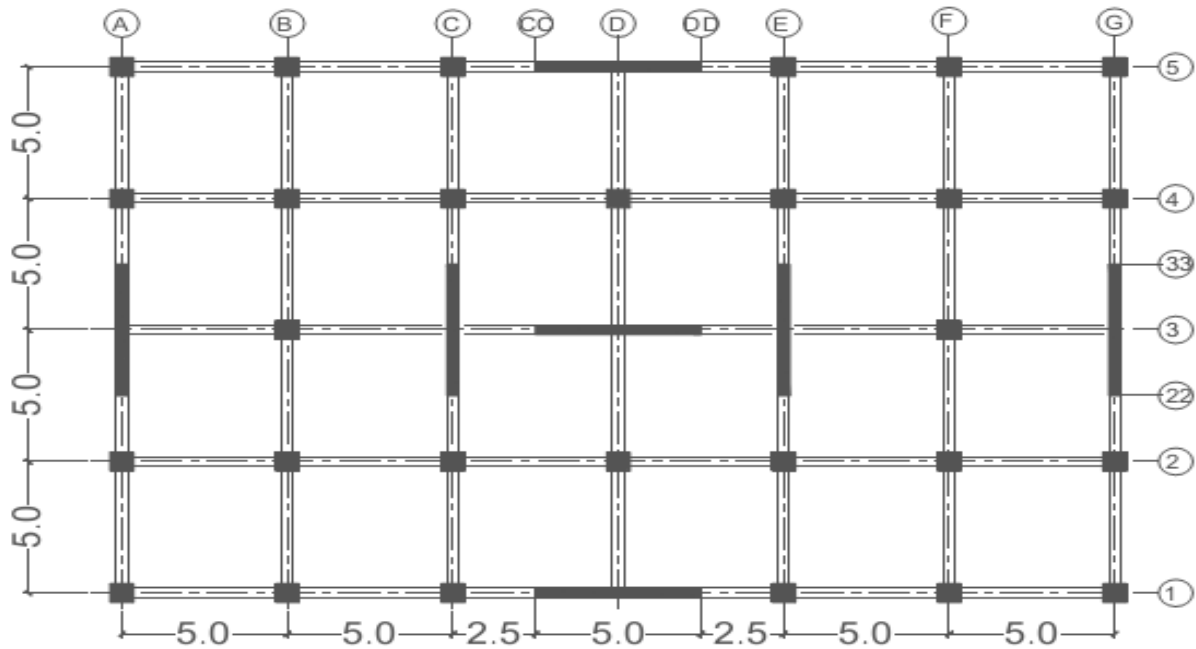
Typical structural layout of building Model 5 (G+30)
